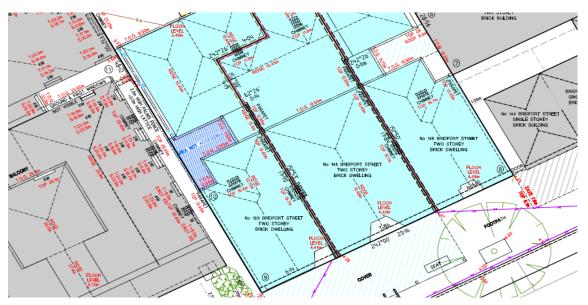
Screenshot of existing 2 storey wall on boundary conditions. Source: Plan of Reestablishment and Detail Survey by JRL Land surveyors
